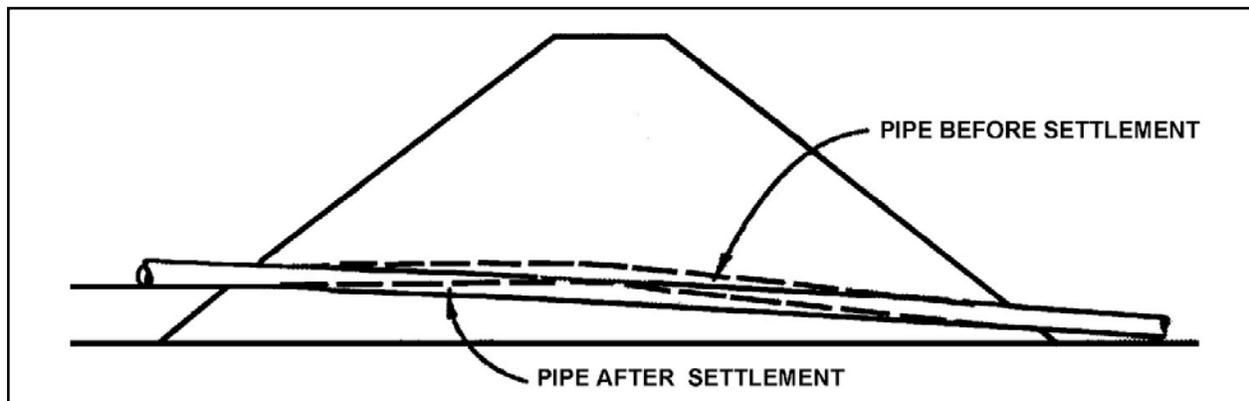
Cambered and Raised Pipe Beneath a Dike
